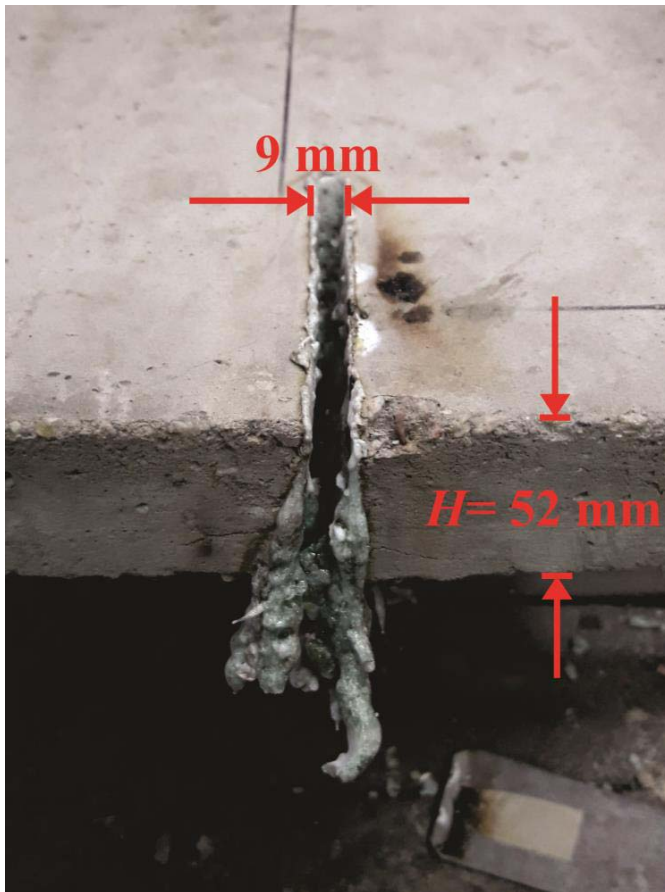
Photograph of a typical kerf in a concrete plate after the plasma cutting ( $H = 52$  mm).
